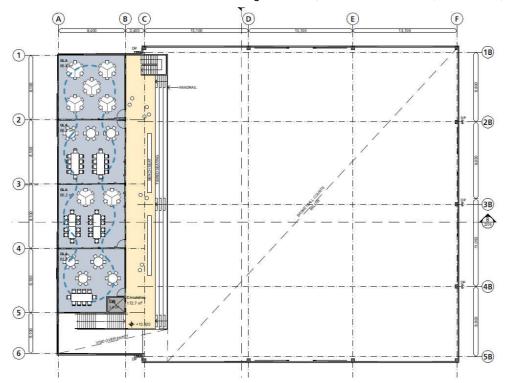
Plan of the MPC First Floor showing the GLA's, Courts and facilities. (SHAC Sheet 3003)
